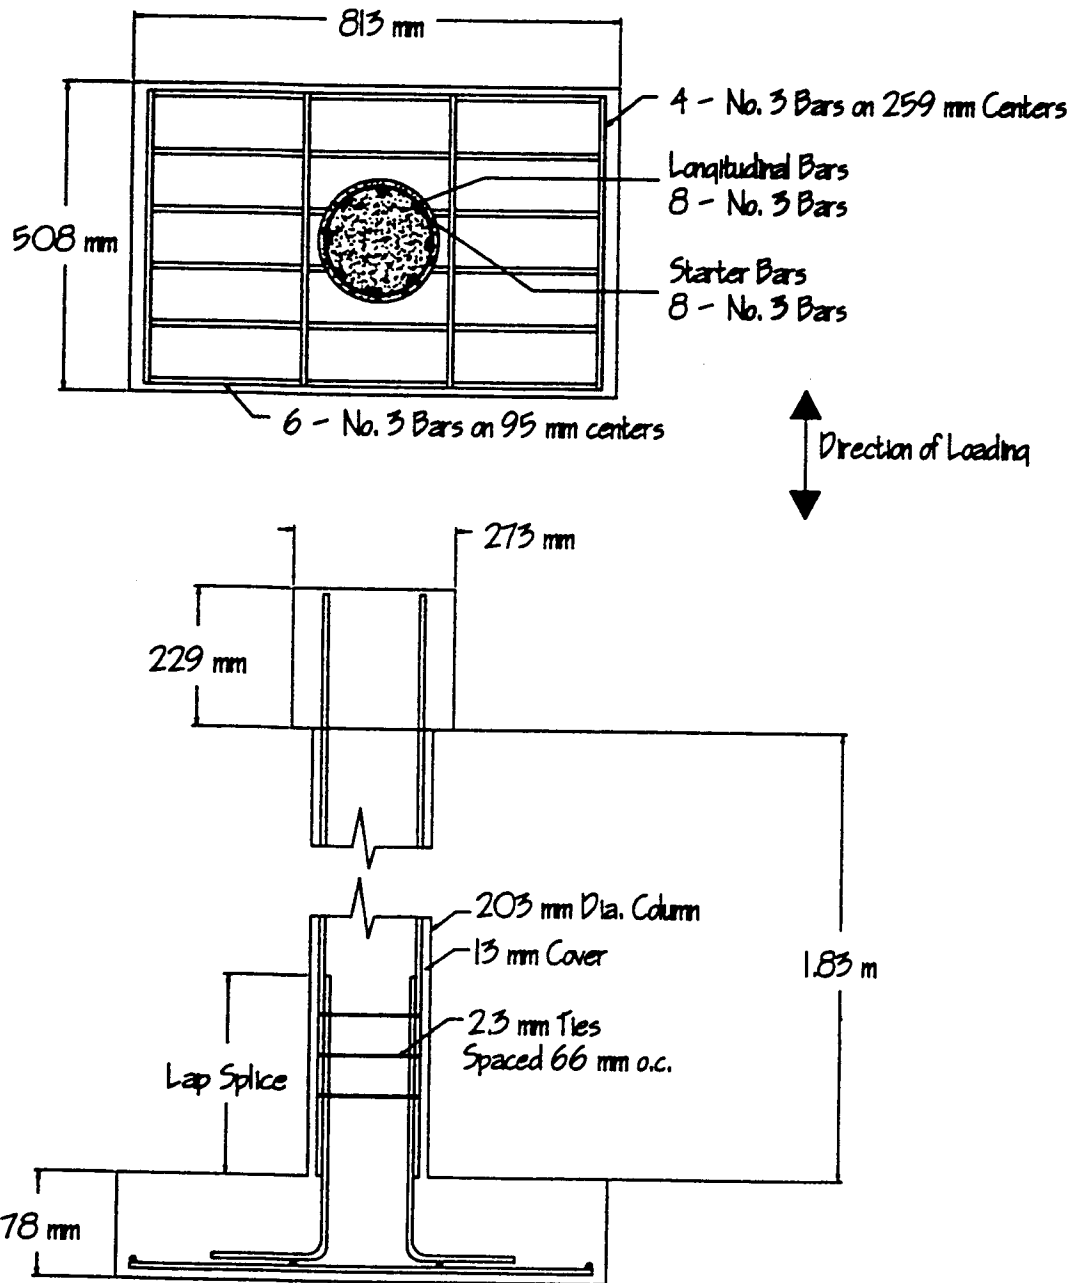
Details of Specimen No. 1 representing as-built conditions.
